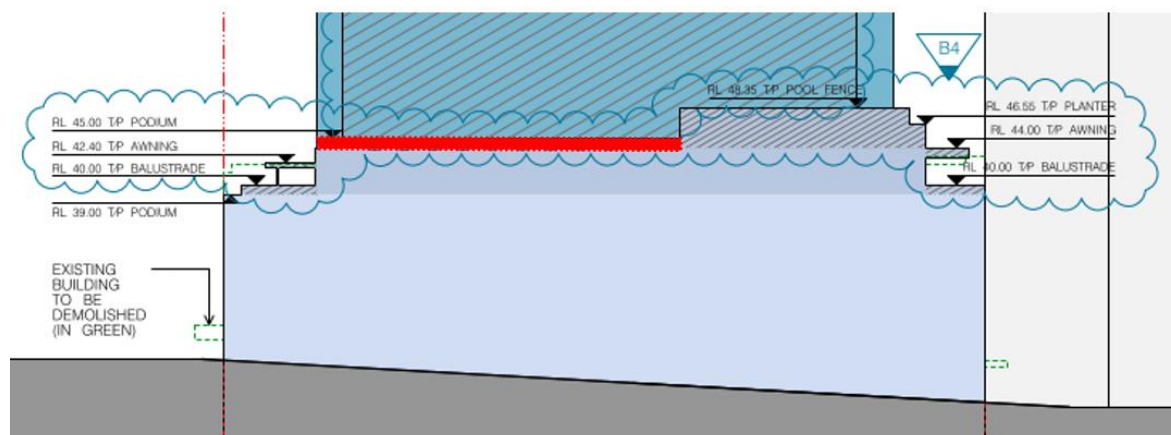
Proposed northern elevation - area in red identifies location of amended podium height from RL 44.00 (approved) to RL 45.00 (proposed)
